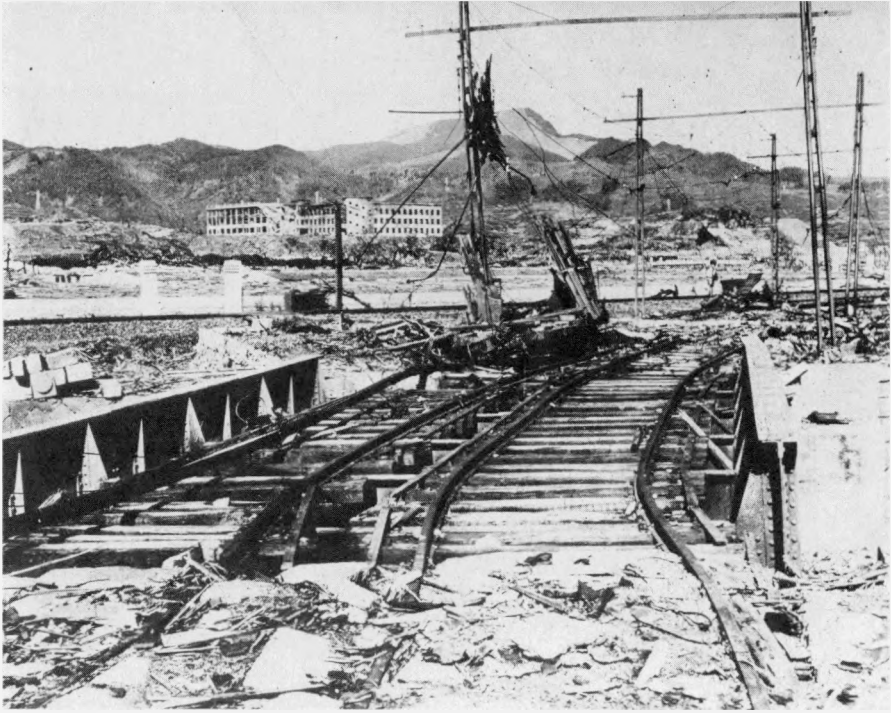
A steel-plate girder, double-track railway bridge (0.16 mile from ground zero at Nagasaki). The plate girders were moved about 3 feet by the blast; the railroad track was bent out of shape and trolley cars were demolished, but the poles were left standing.
